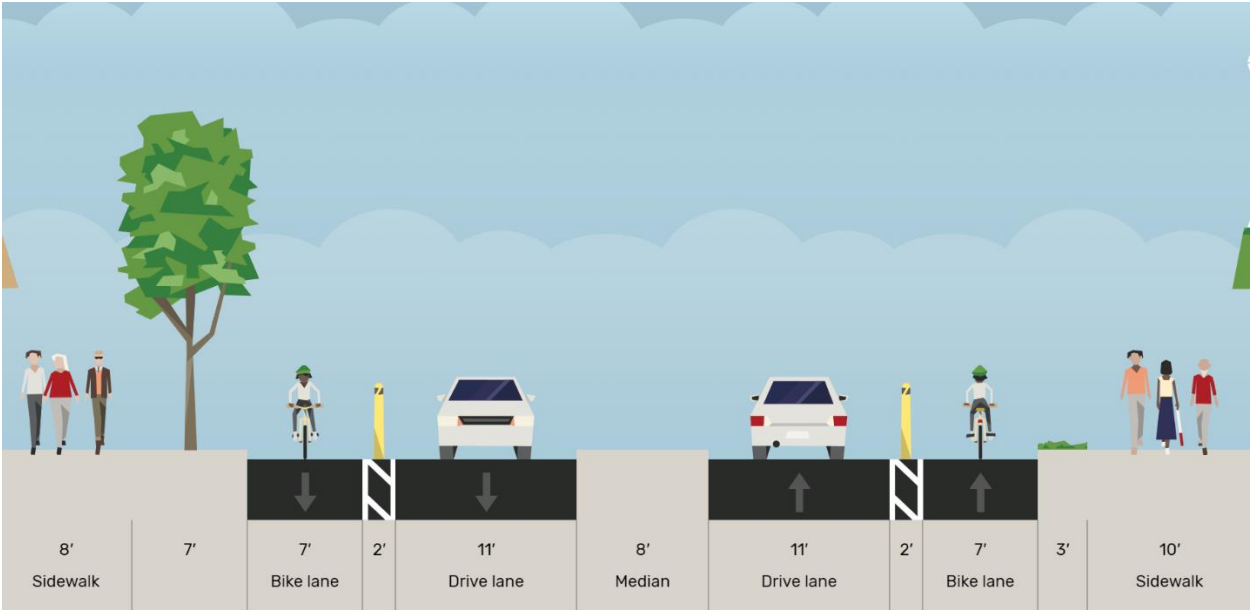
HOLLAND LANE CORRIDOR ALTERNATIVE 1 CROSS-SECTION FROM EISENHOWER AVENUE TO JAMIESON AVENUE
